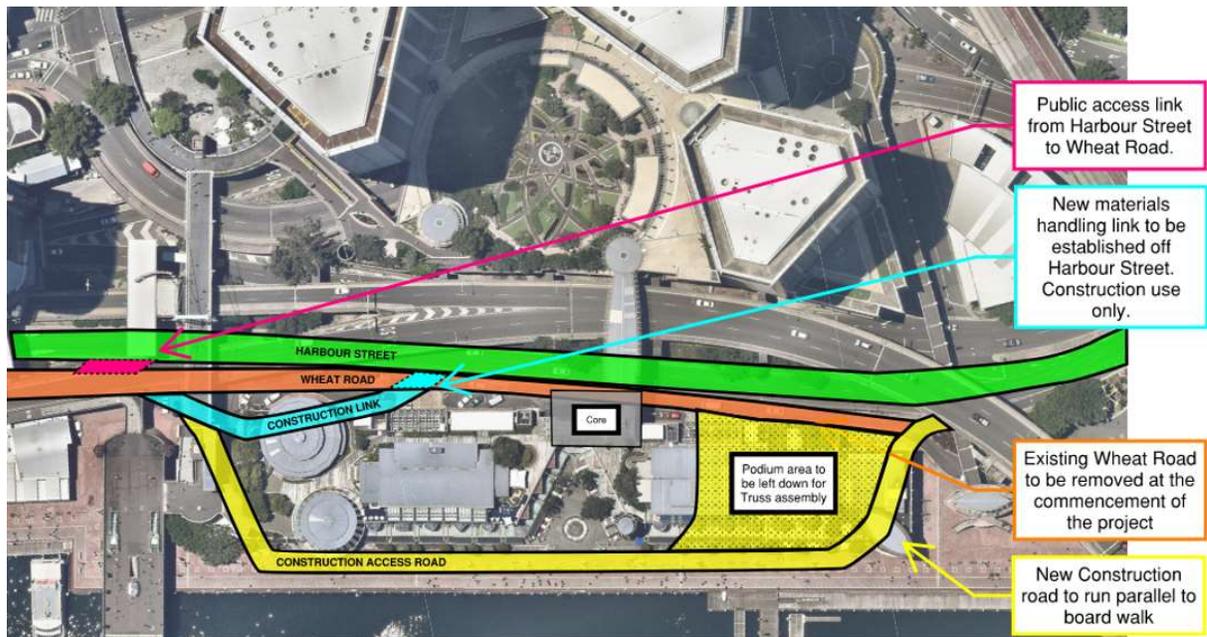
Construction vehicle access (Source: Construction Management Plan, Multiplex)
